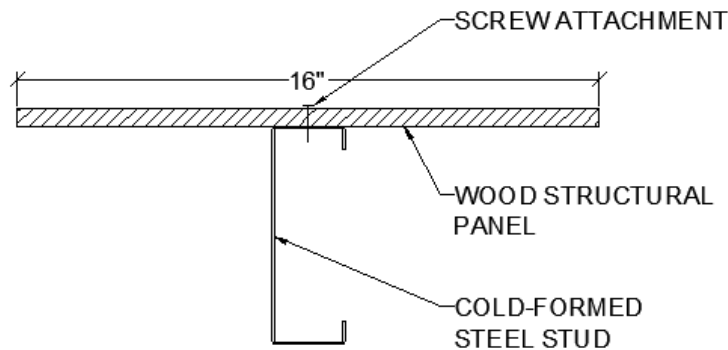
Composite Section of CFS Stud and Wood Structural Panel
